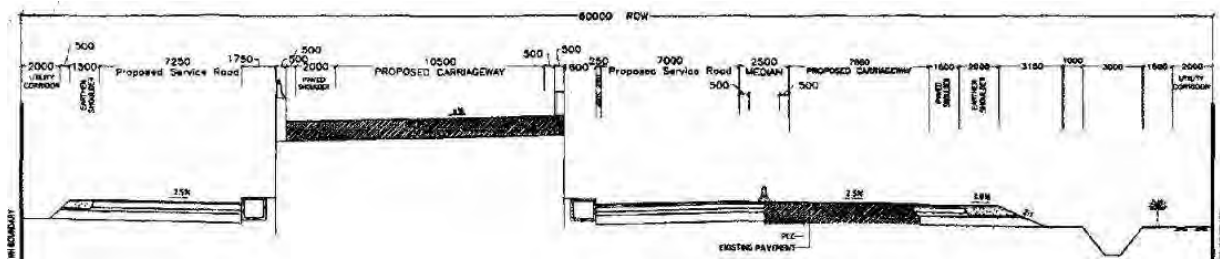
Typical Cross Section for 3 lane flyover left side payment widening with service road (TCS-18)
